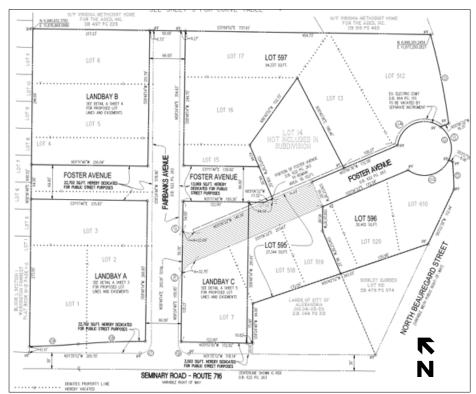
Upland Park Phase 1, resubdivision plan showing realigned and extended Foster Avenue, other street dedications, and parcels.
